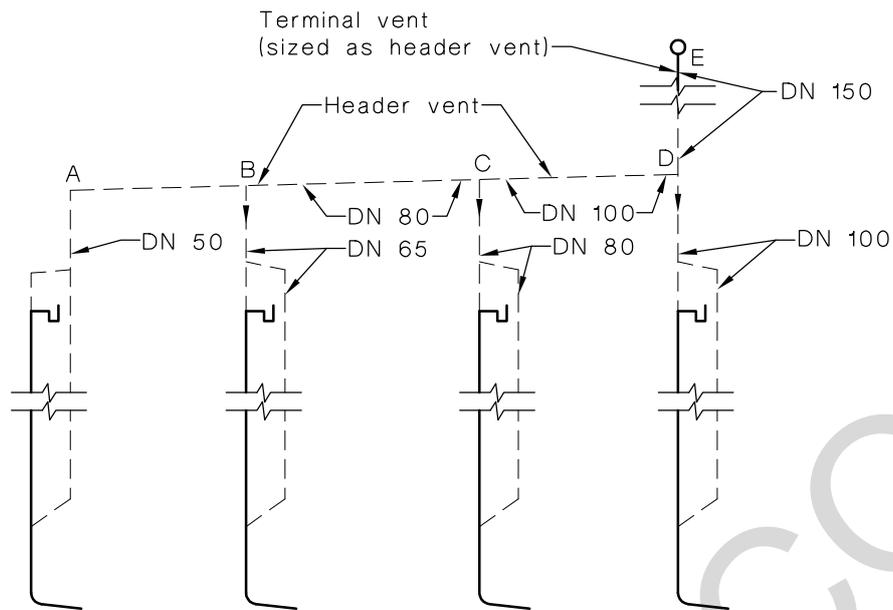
TYPICAL INSTALLATION OF CROSS-RELIEF VENT
